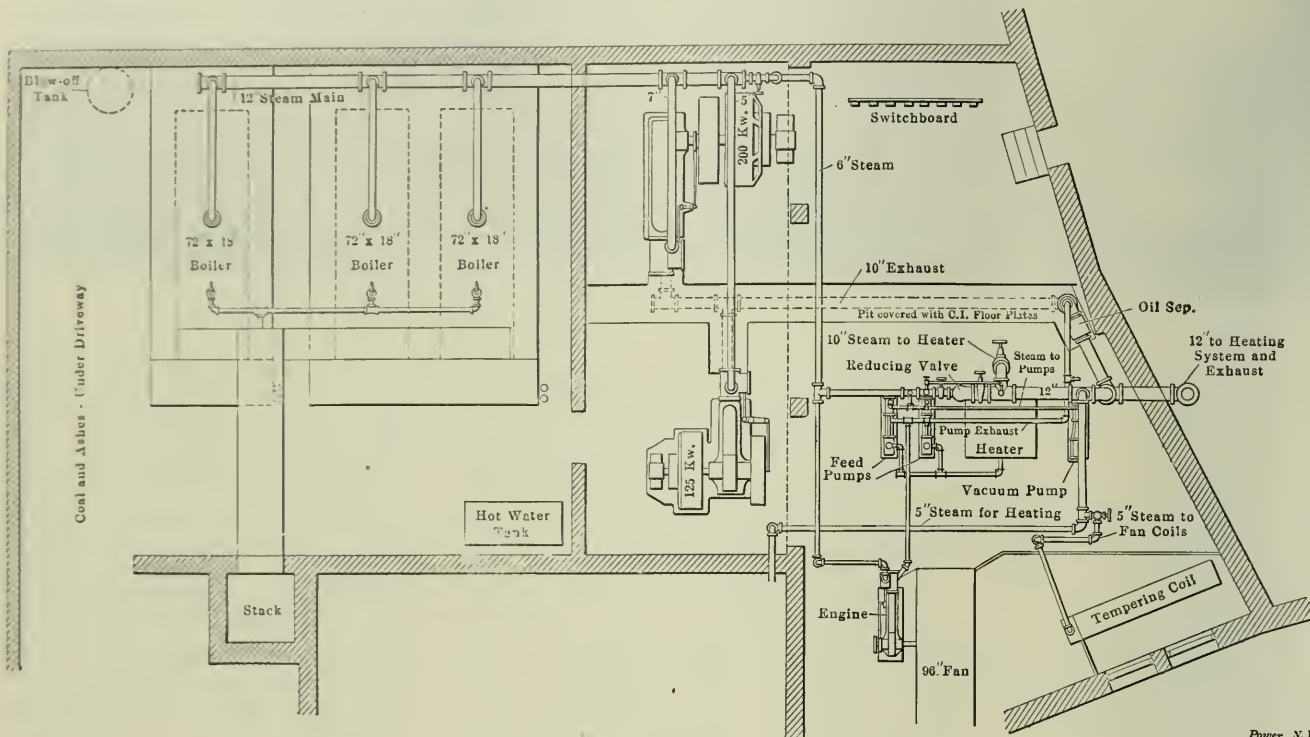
PLAN OF ENGINE AND BOILER ROOMS
